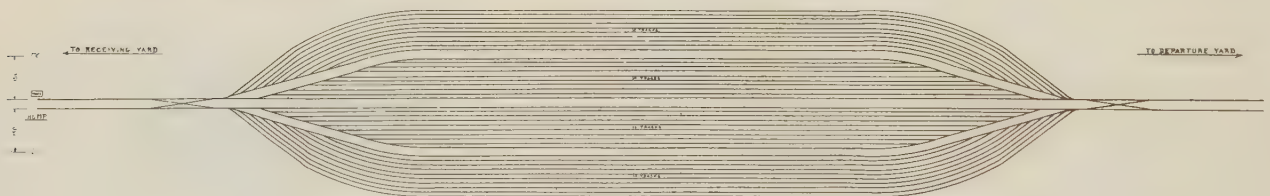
TYPICAL LIGHTING WITH TOWERS AT HUMP
